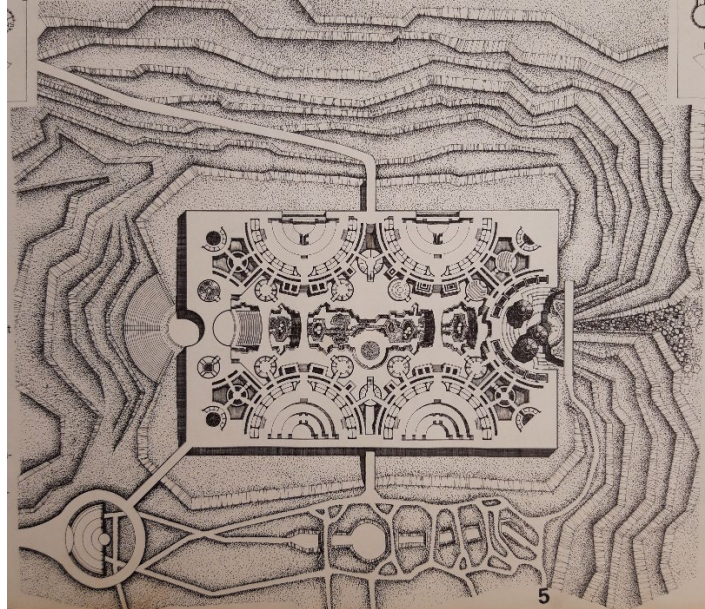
Ground floor plan of Arcosanti, original scale 1:2000 (Paolo Soleri, 1969, MIT Press)
